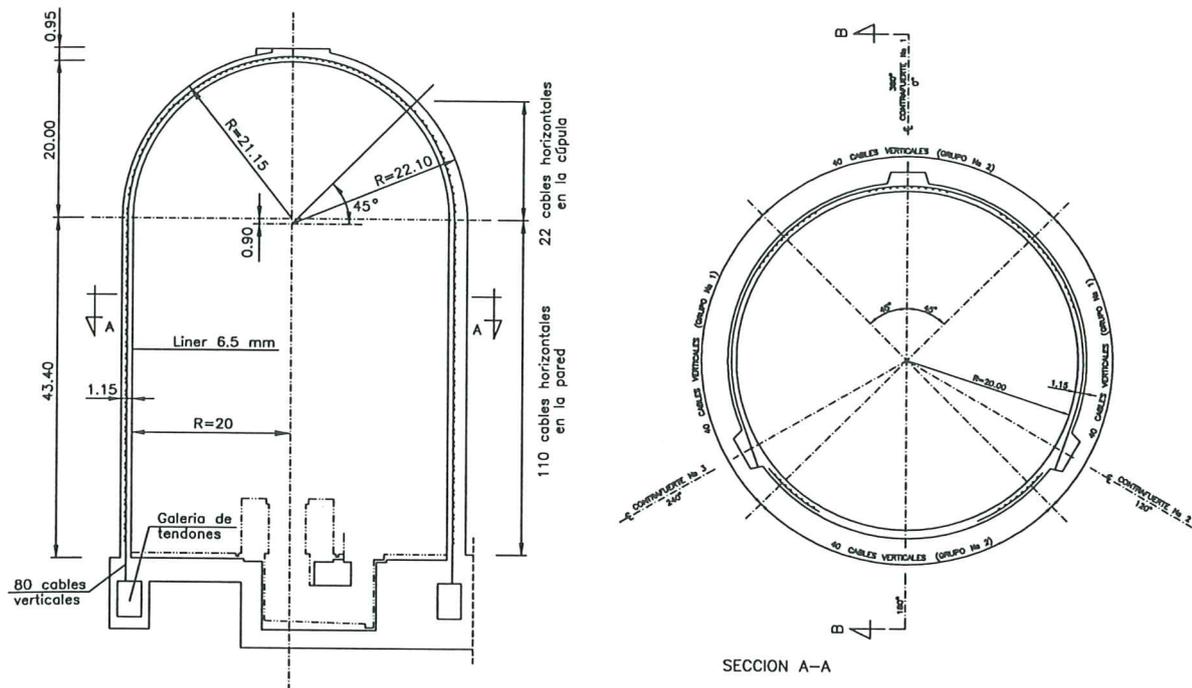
Containment shell. (a) vertical section; (b) horizontal section.
